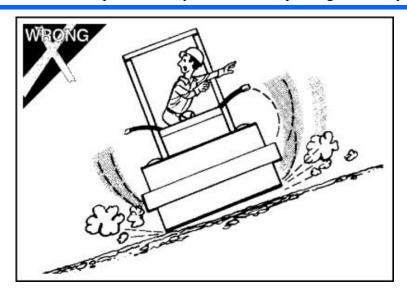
Adjust the driving speed to adapt to the horizontal slope and steering condition
